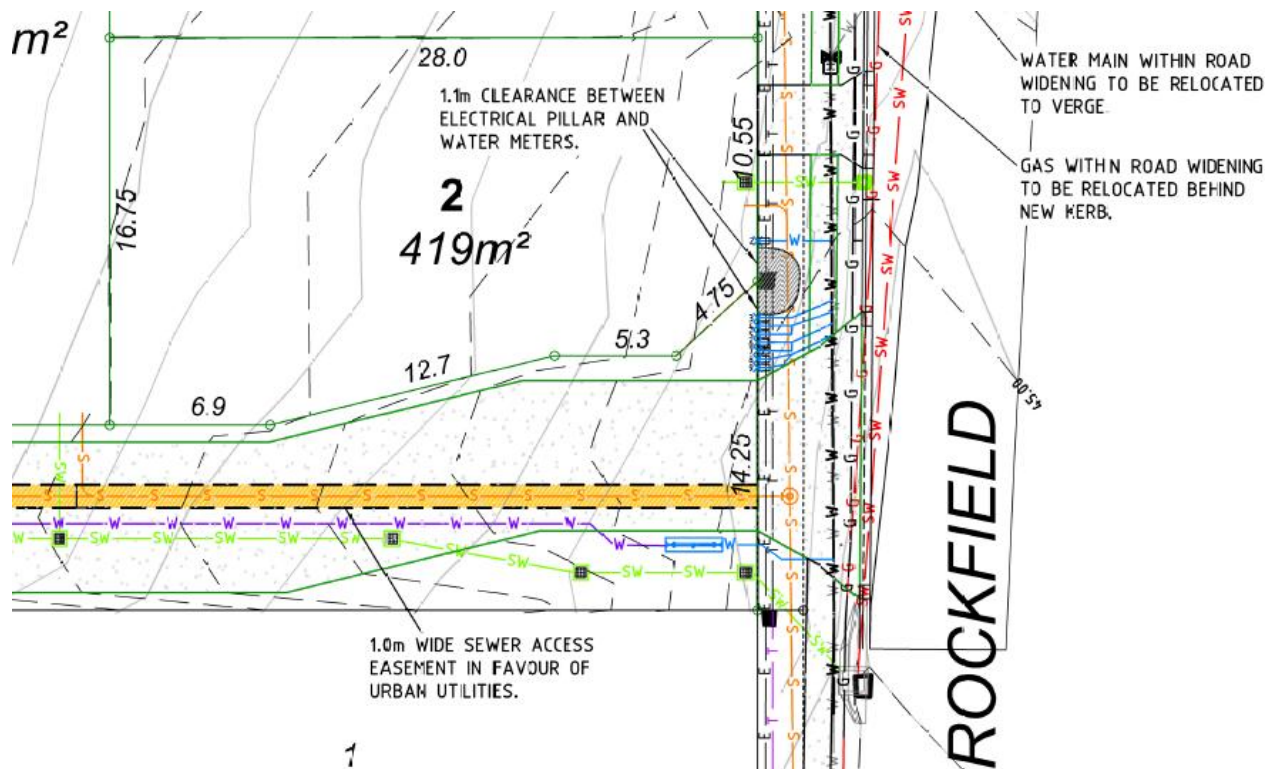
Proposed Lot 2 - Civil Engineering Services Plan
